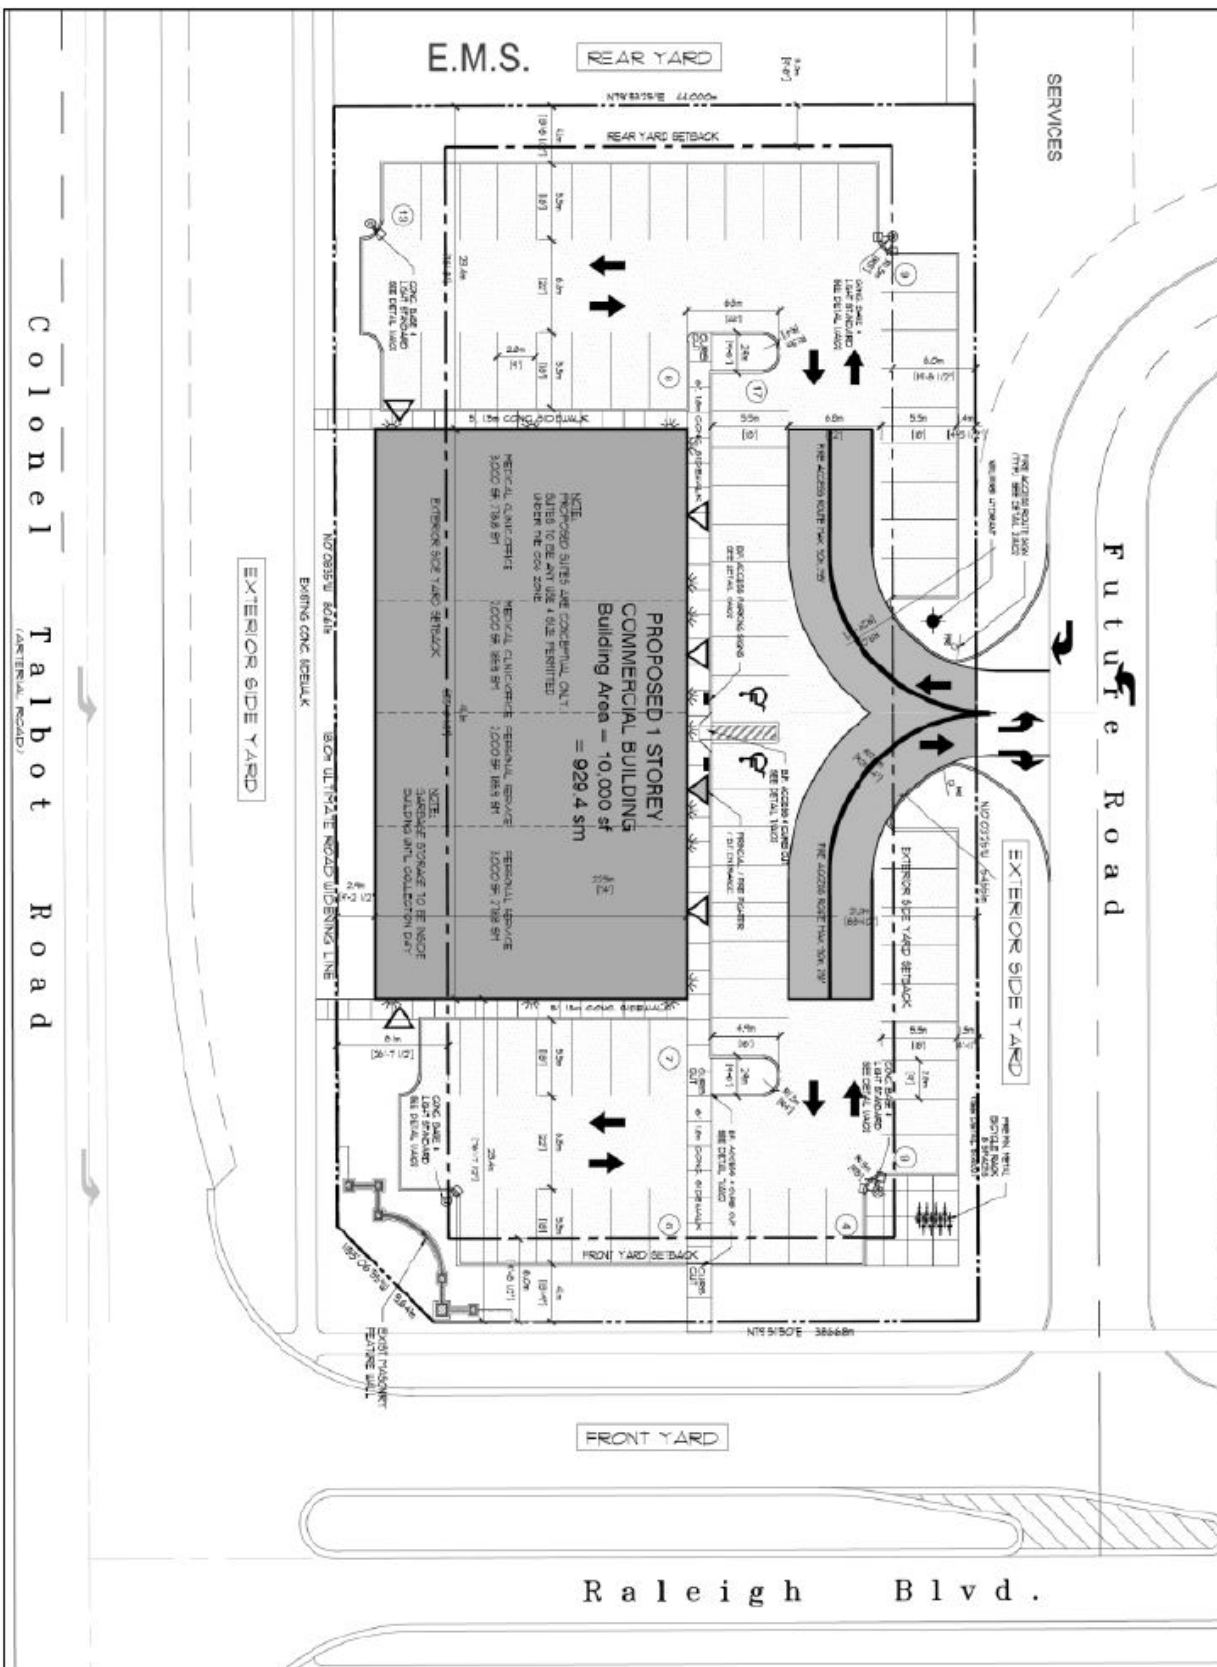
Conceptual site plan depicting the proposed building situated along the Colonel Talbot Road corridor
